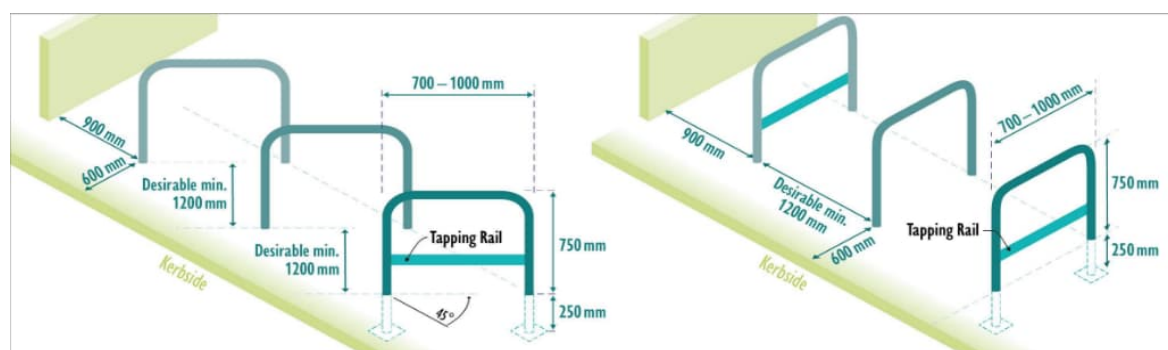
Typical Layout of Sheffield Stands (Source: Cycling by Design)
